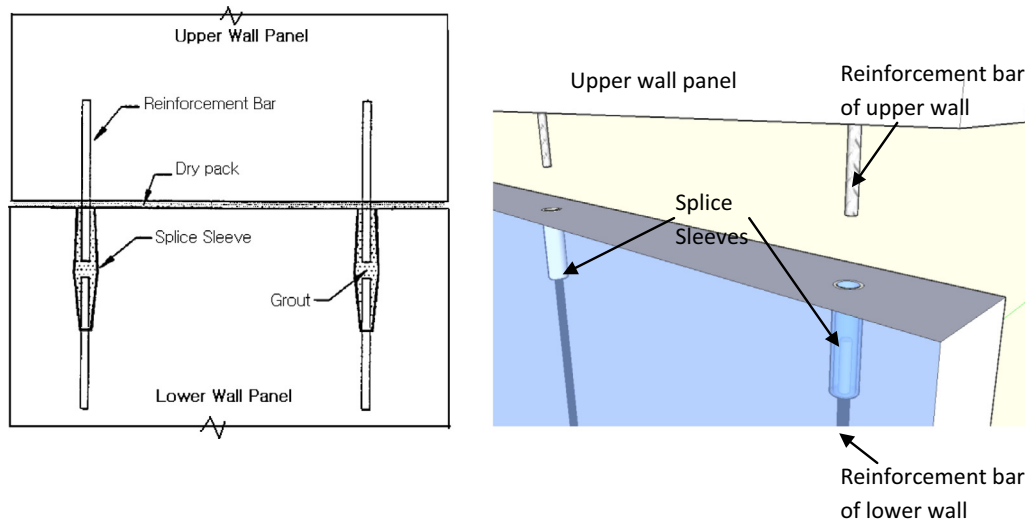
Grouted splice sleeve connection in precast concrete wall panels [9].
